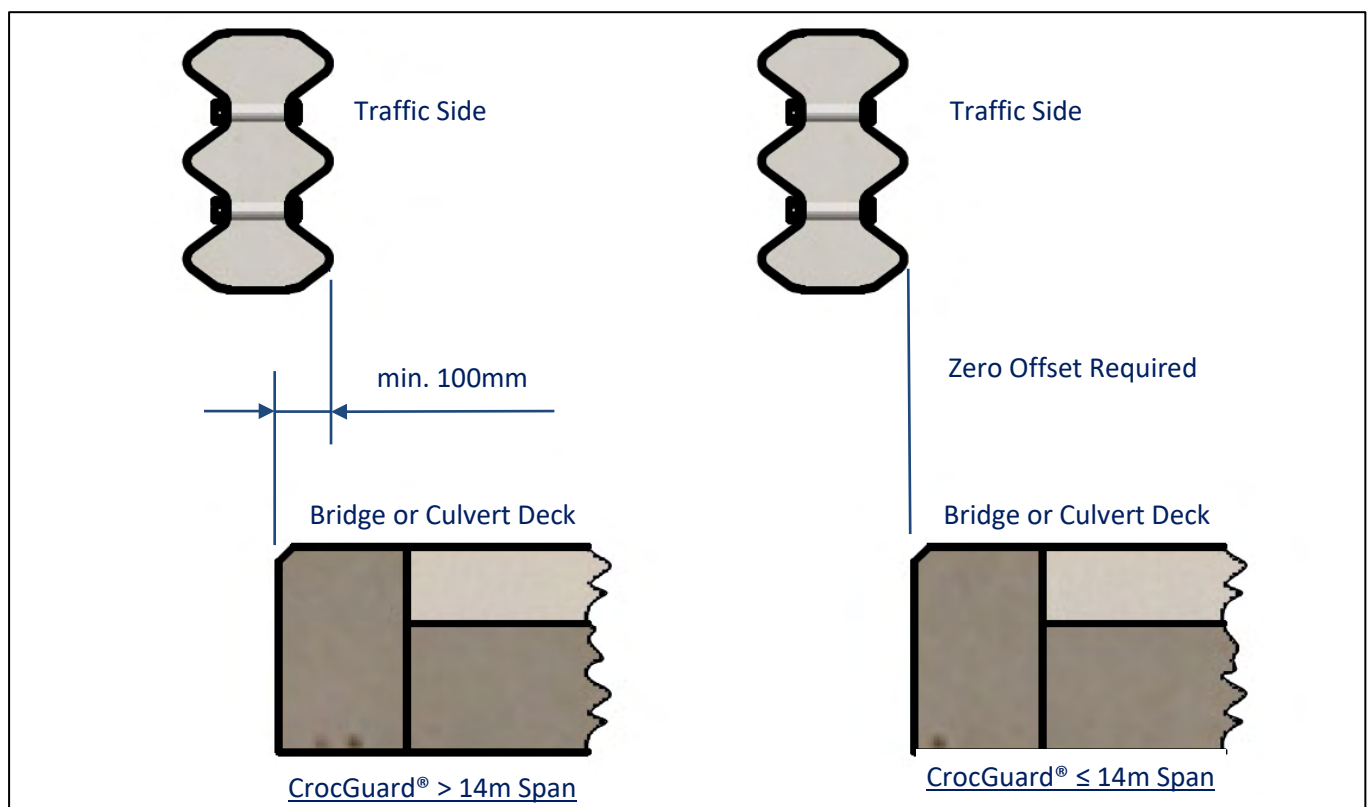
CrocGuard® Alignment with Edge of Bridge or Culvert Deck
